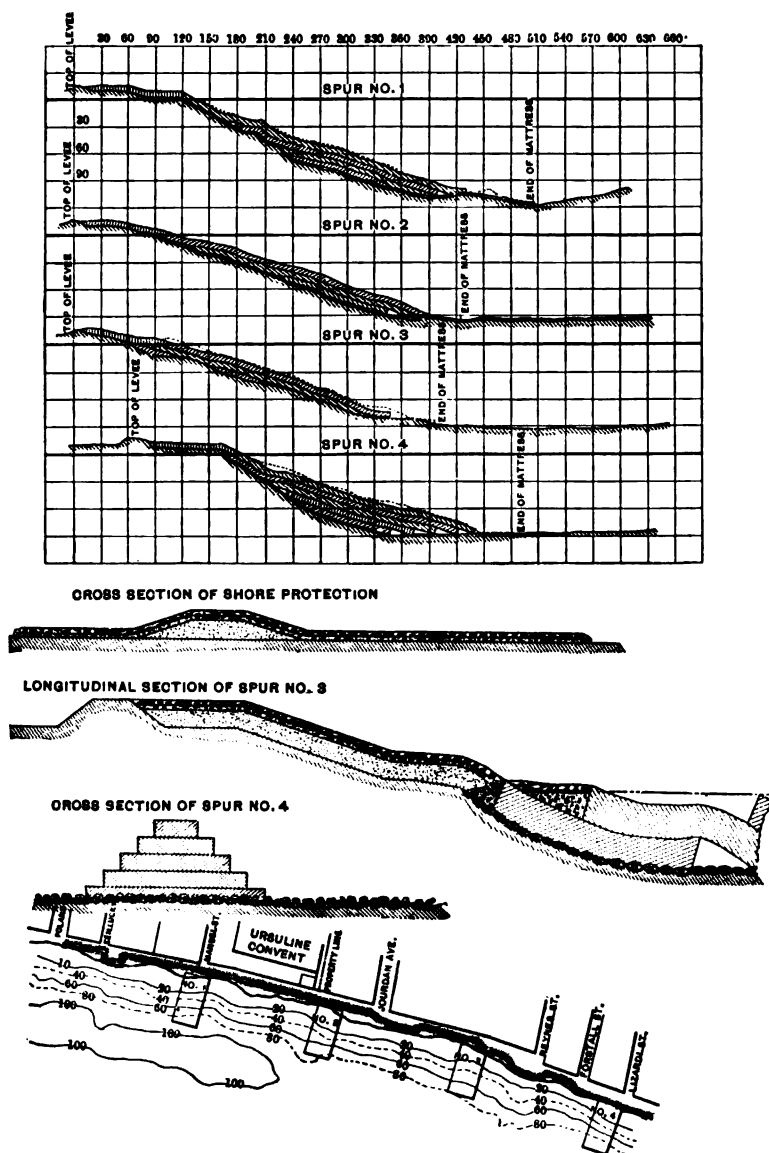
New Orleans Spur Revetments. (For Bank Protection.)
